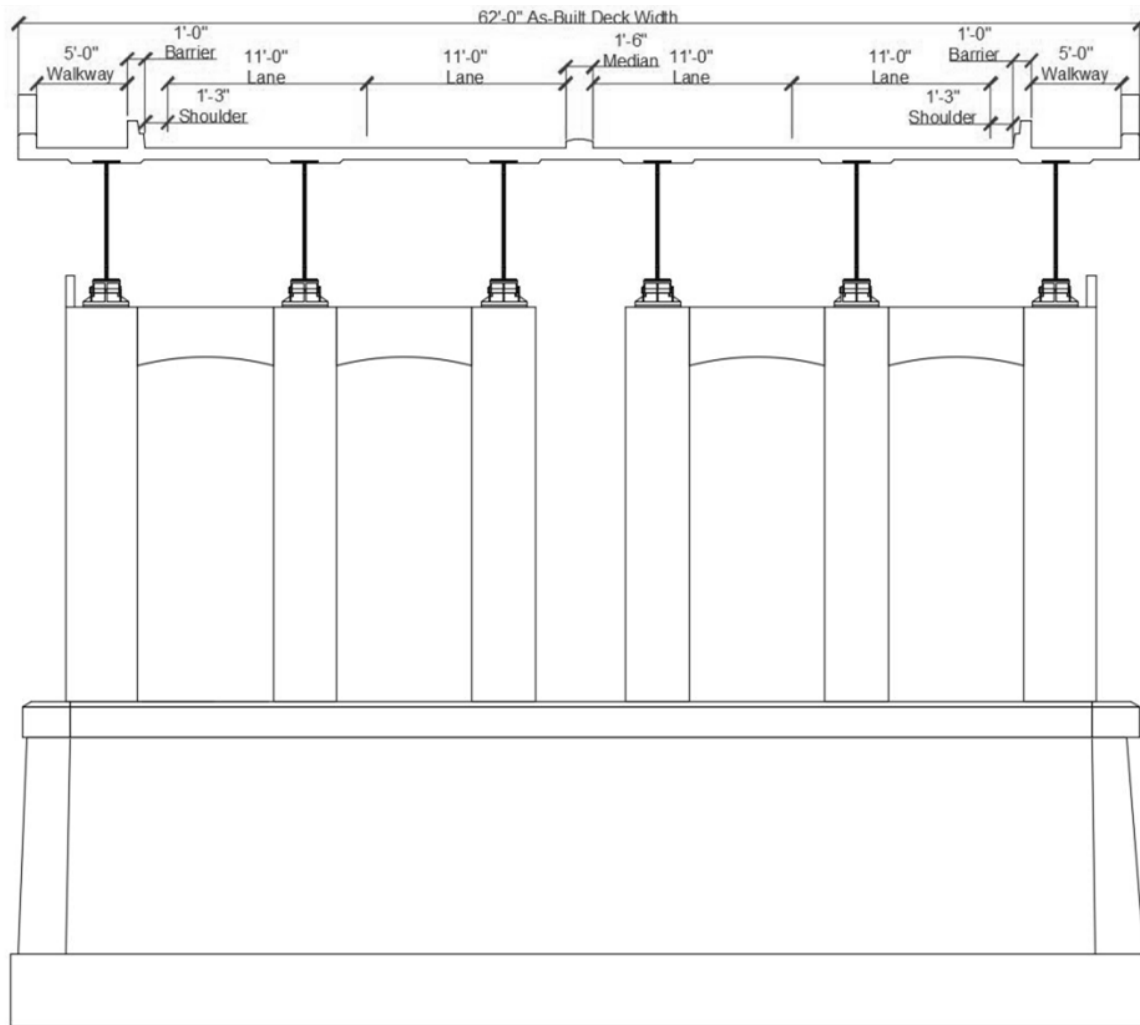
Existing Bridge Deck Cross-Section and As-built Typical Bent Substructure Configuration
